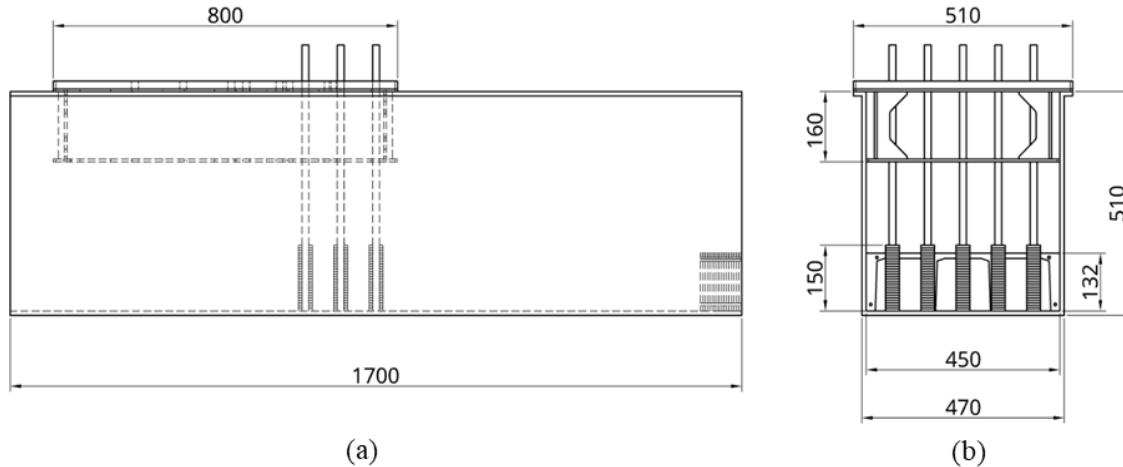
Dimensions of the (a) side view and (b) front view of the model pier rig
